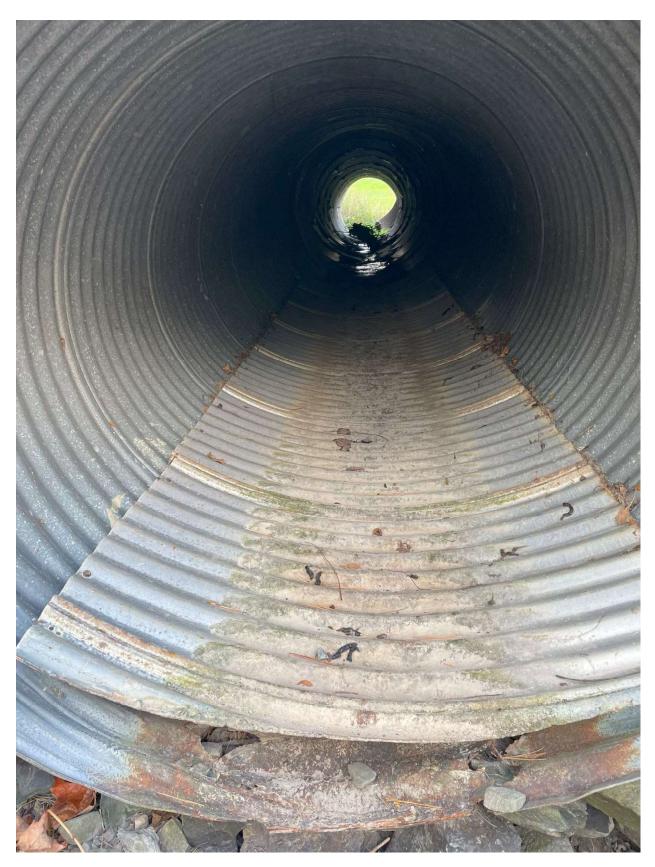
Garrett Road culvert looking west. No embedment throughout the culvert.
